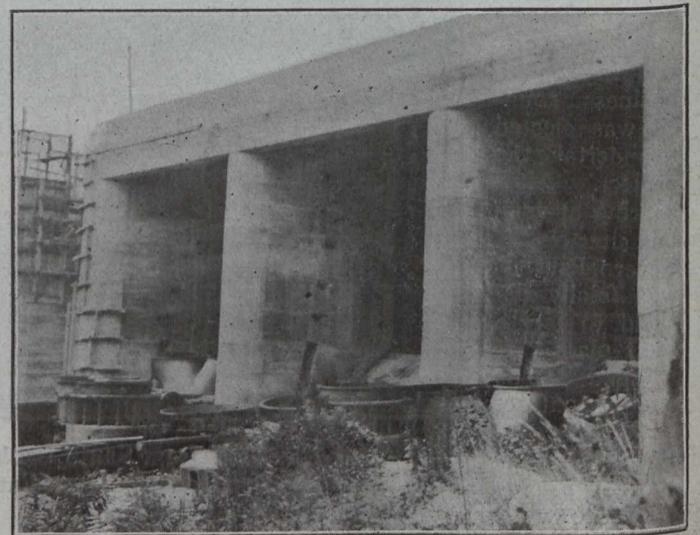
Upstream Side of Wheel-pit House; Wheel Parts in Foreground Ready to be Assembled
